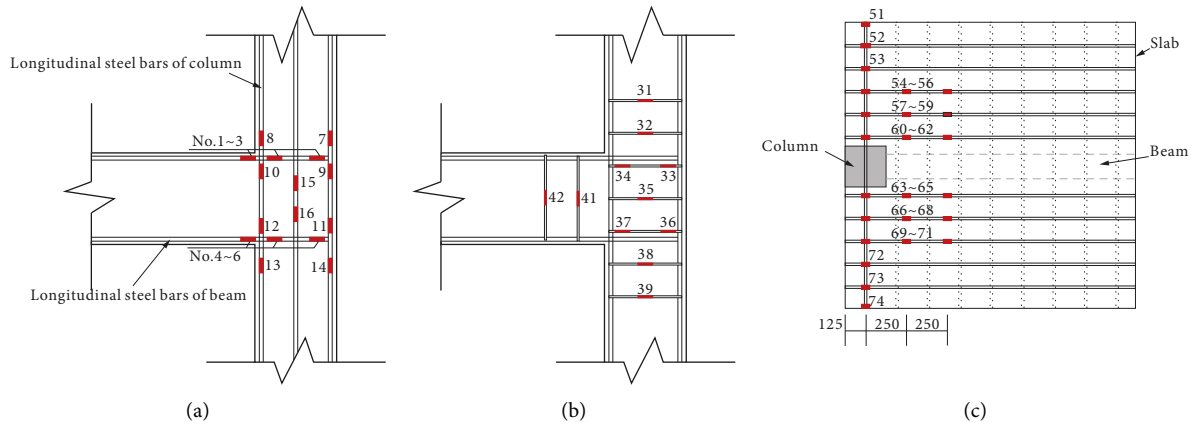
Arrangement of strain gauges for steel bars. (a) Strain gauges of longitudinal reinforcement. (b) Strain gauges of stirrup. (c) Strain gauges of steel reinforcement in slab.
